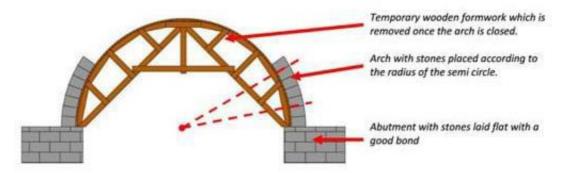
Indicative temporary support system to be constructed and installed to support bridge during construction phase
